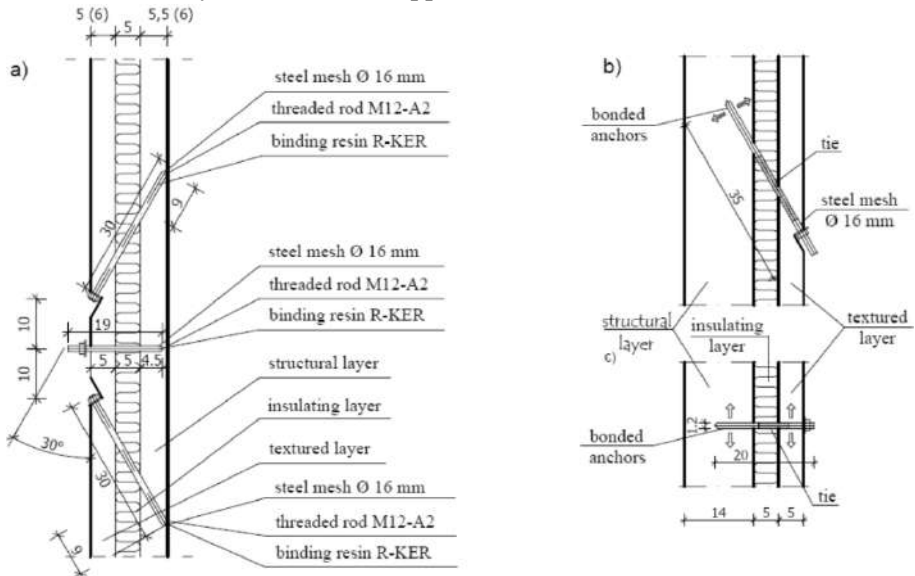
View of the COPY-ECO anchor system for reinforcing external wall panels of large-panel slab buildings: a) horizontal anchor M12 x 190 mm, b) diagonal anchor M12 x 330 mm
